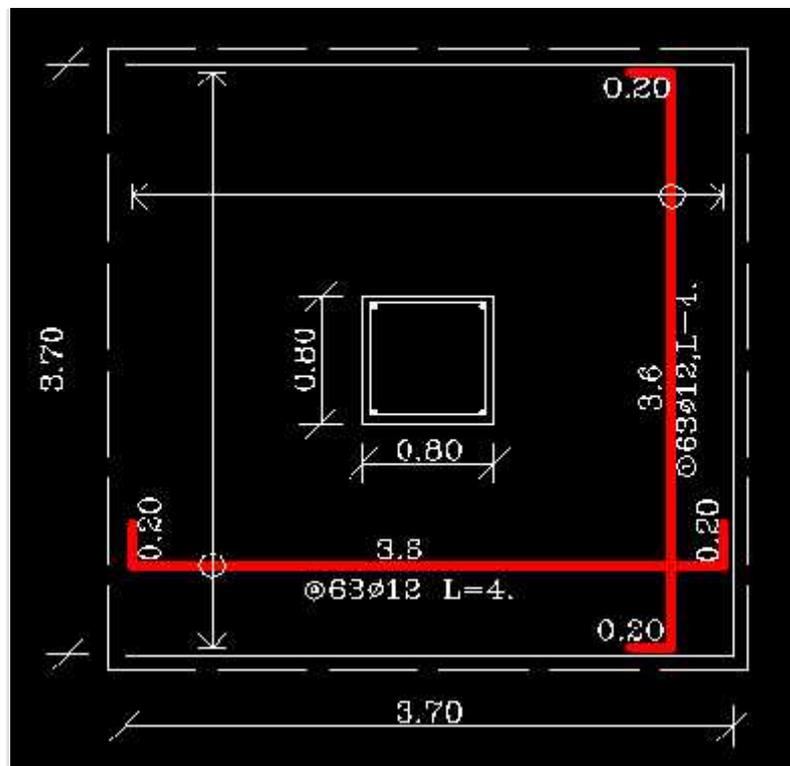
Detail of Isolated Footing (F13)
